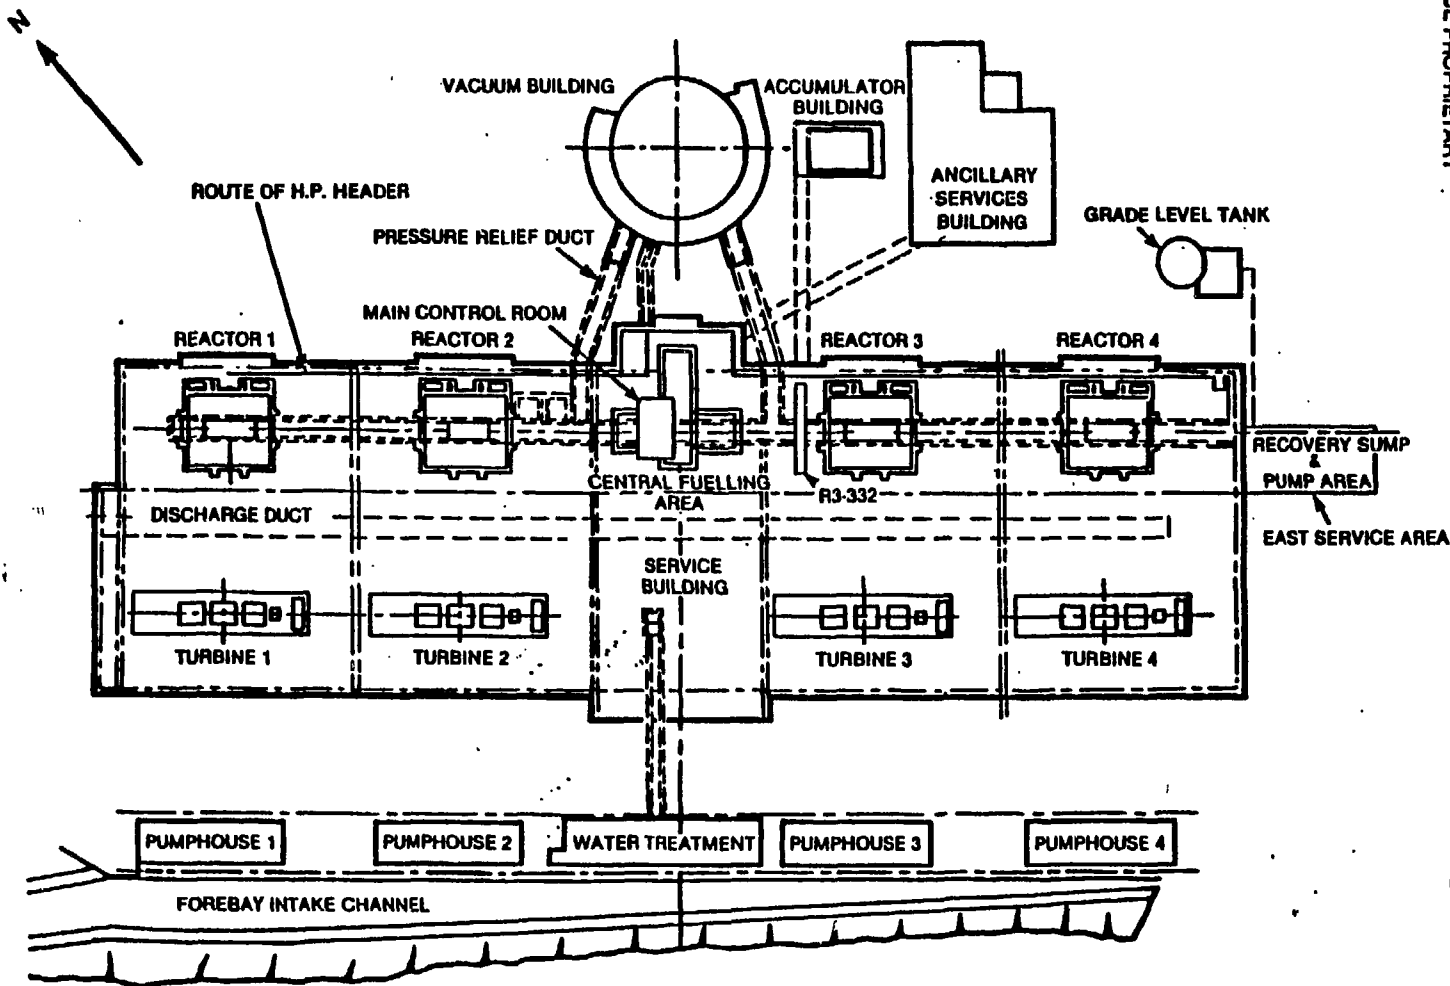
BRUCE "A" GENERATING STATION SITE PLAN
